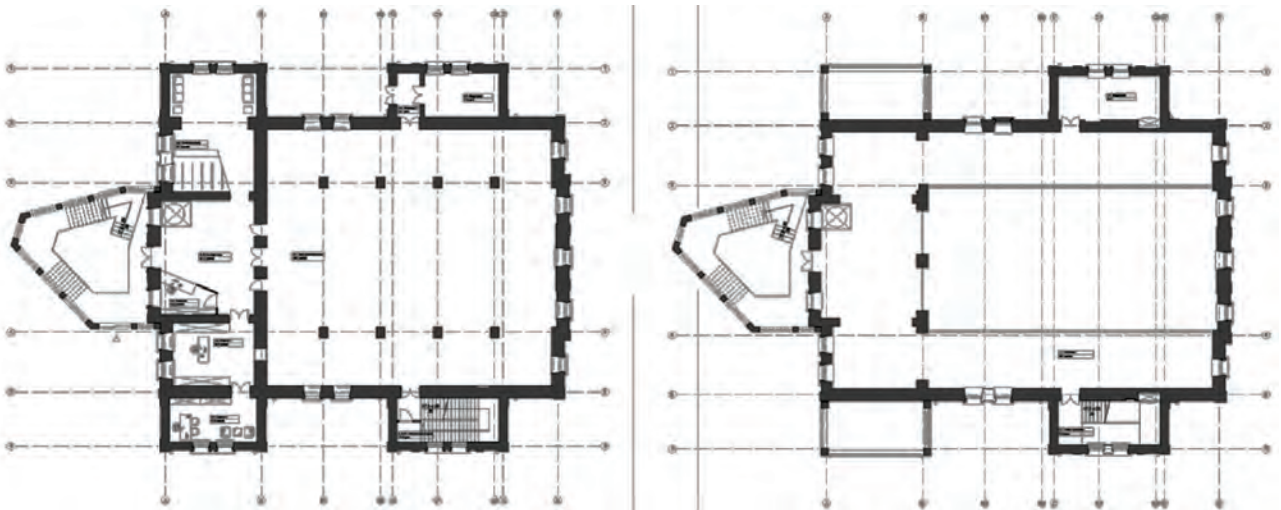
Synagogue in Kielce. Design. Drawings of individual floor plans of the building (ground floor, first floor) – design [24]
